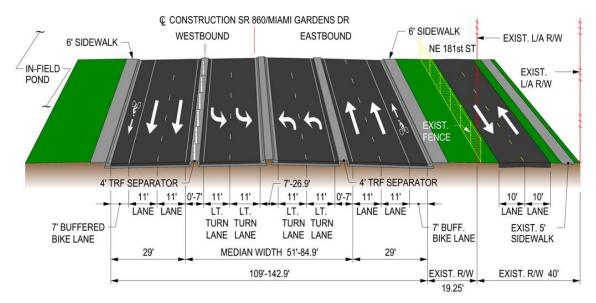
3: Proposed Typical Section - Alternative 1 – SR 860/Miami Gardens
